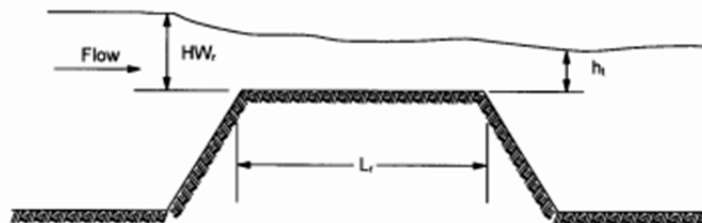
Arizona DOT cross section (*Drainage Manual*, 2016).
